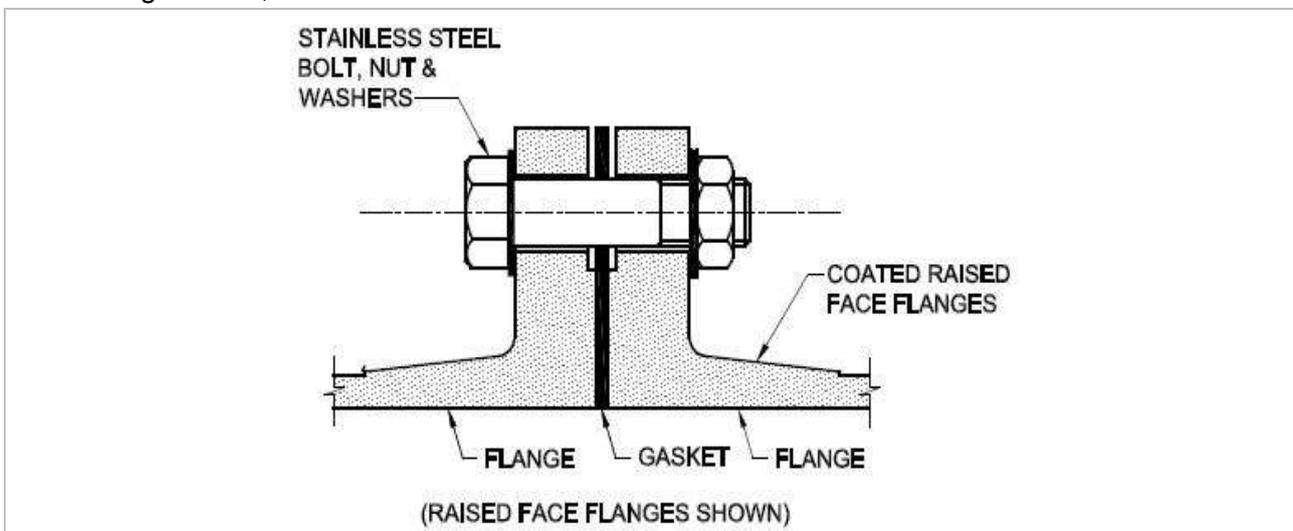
TYPICAL BOLTED CONNECTION DETAIL FOR FUSION BONDED COATED DUCTILE IRON FLANGES WITH STAINLESS STEEL FASTENERS
